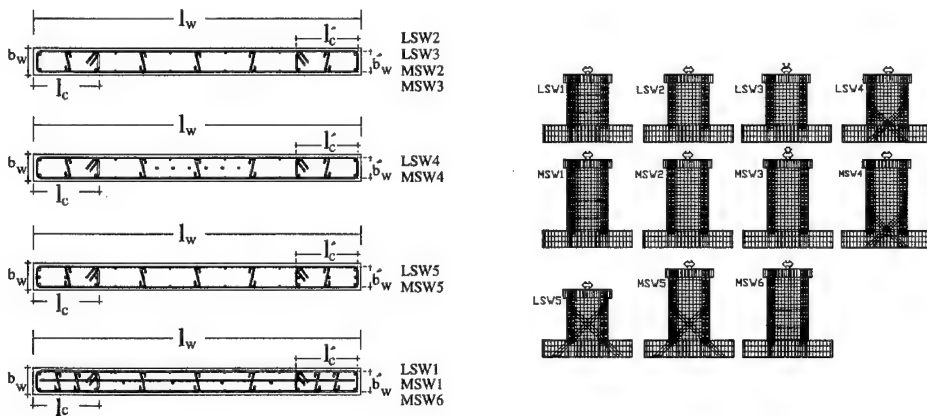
Main parameters of wall specimens and arrangement of reinforcement
